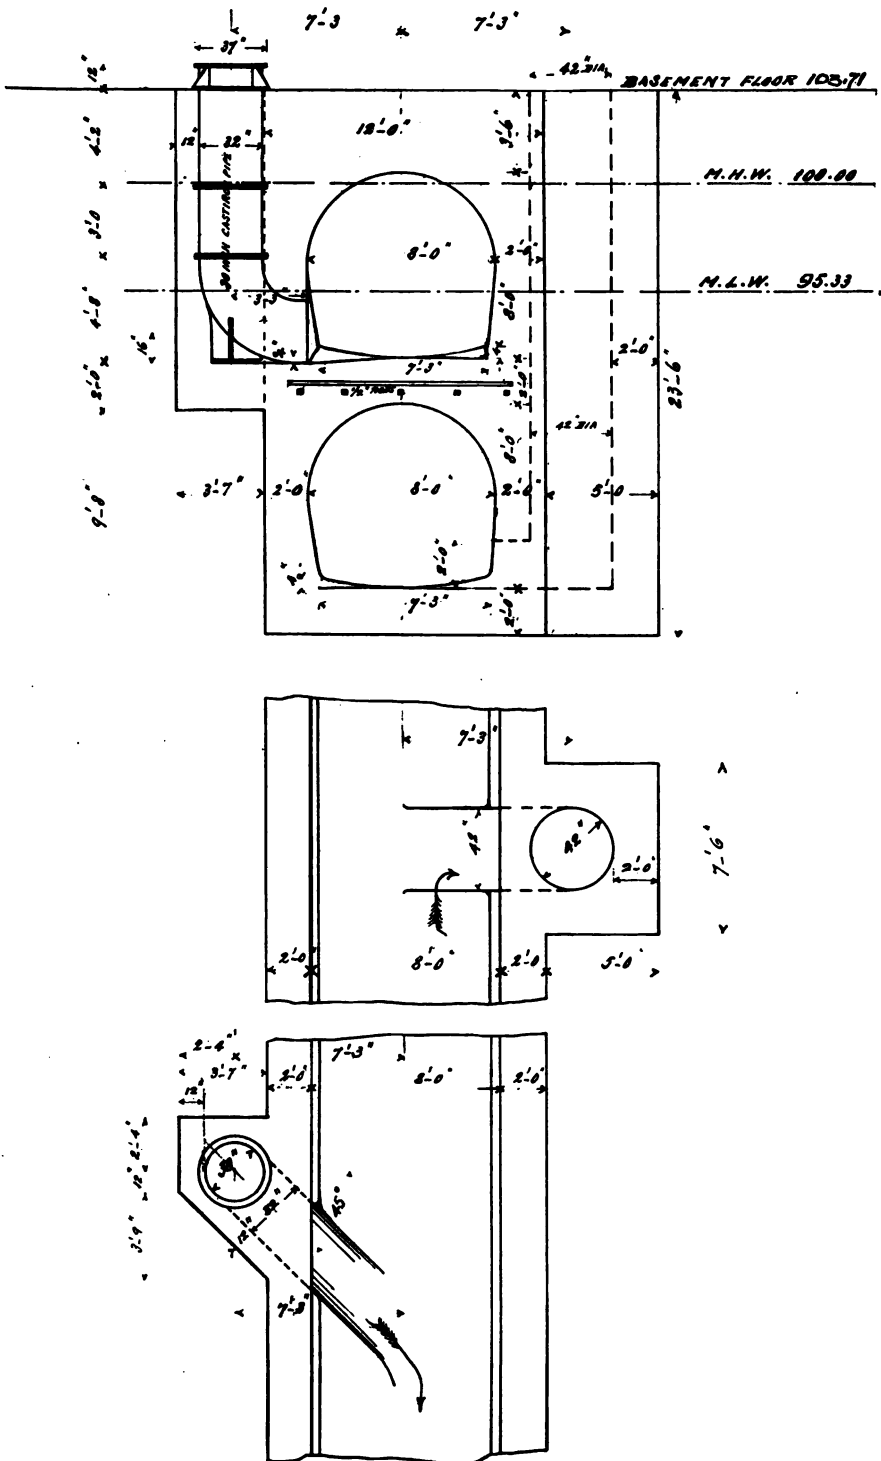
Sections of Condensing Tunnels, Gold Street Station.
